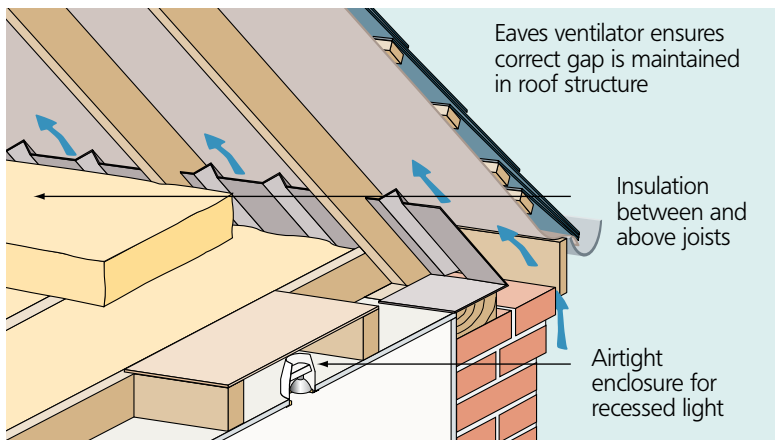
Best practice for roof insulation at ceiling level – between and over joists
